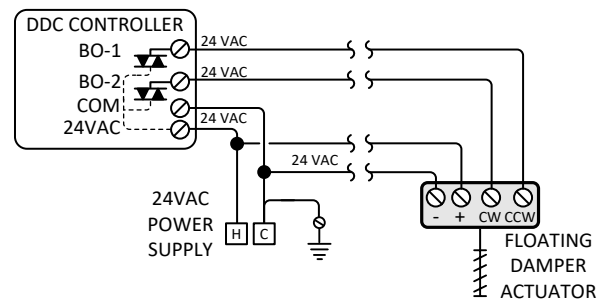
Binary Triac Output (High-Side Switching) Directly Wired to Large Actuator
